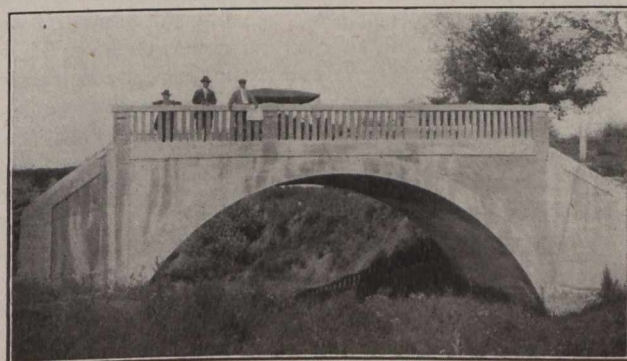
Thirty-foot Concrete Arch Bridge in Russell Township.
